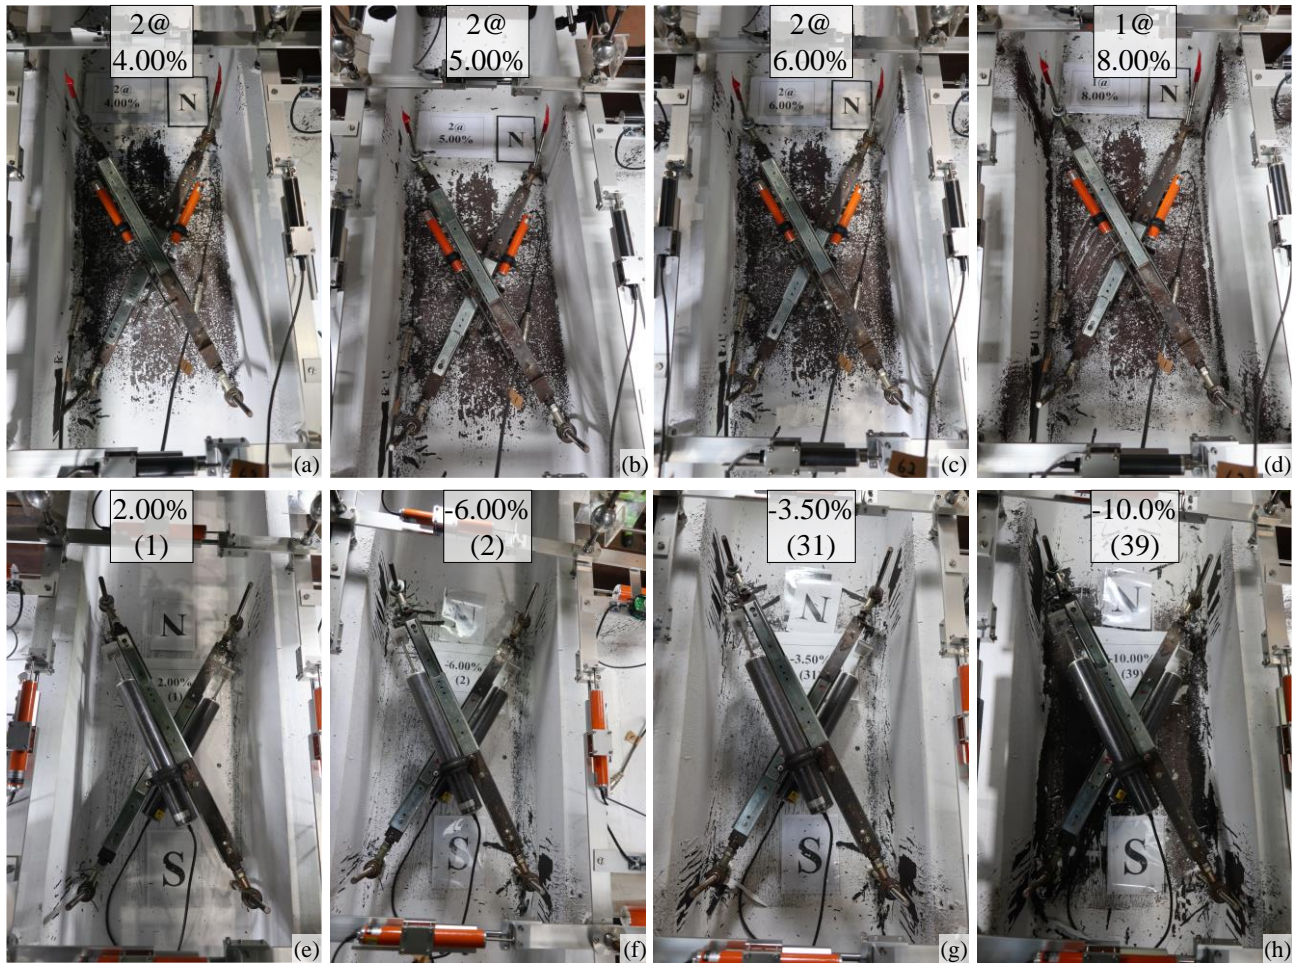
Panel zone deformation at characteristic loading excursions (top: Specimen 1, bottom: Specimen 2).
